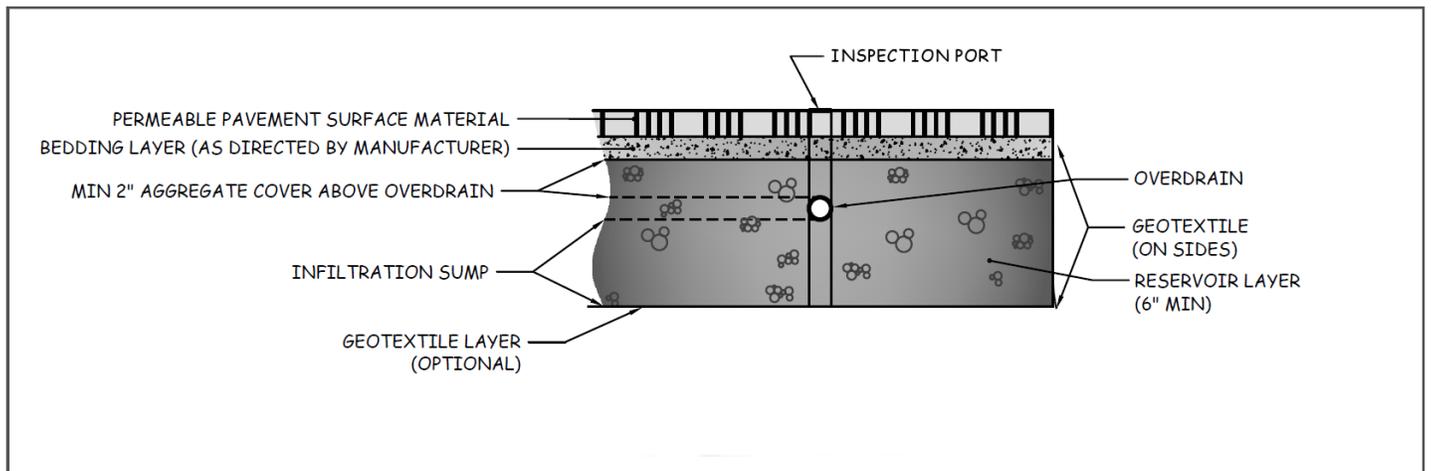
Permeable Pavement with Infiltration Sump and Overdrain
